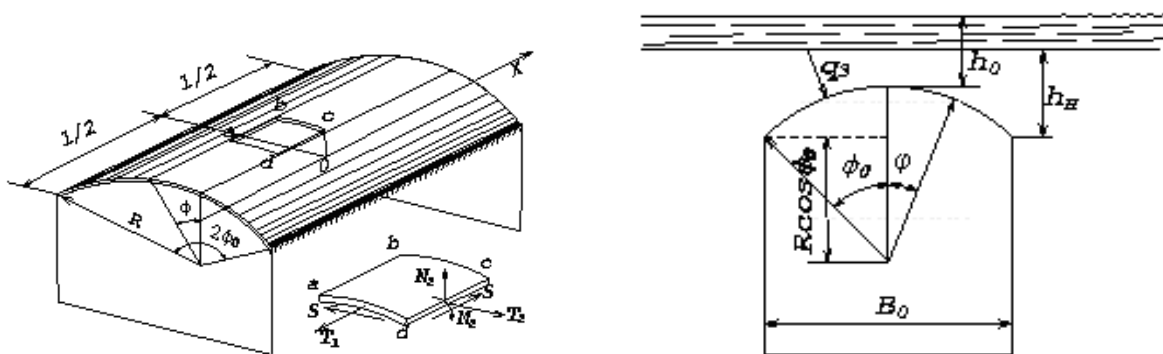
(a) Design model of a cylindrical covering of an underground construction
